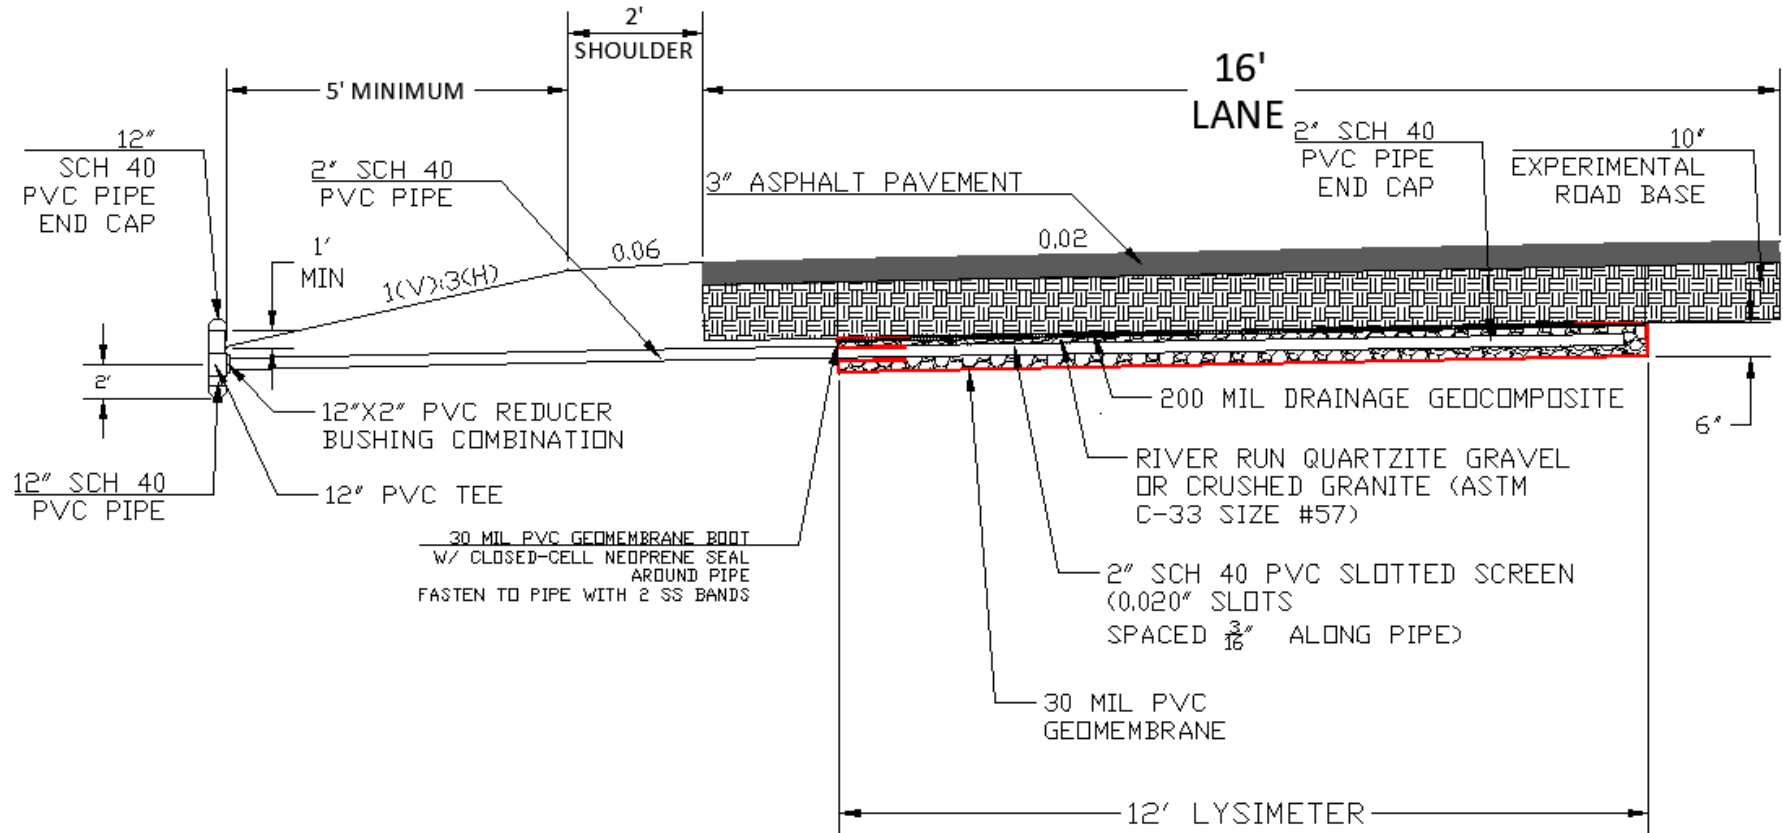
Cross section of a lysimeter, marked in Figure 2-3 as “Section A.” Water traveling through the base layer is directed into the trench along the slopes shown in Section B. The trench is filled with drainage media and holds a slotted PVC pipe. Collected infiltration enters the slots of the pipe which directs the flow into a collection vessel, located a minimum of 5f-t from the road shoulder. The pipe is only slotted along the 12-inch length of the collection area and a geomembrane boot with neoprene seal further isolates the collection area.
